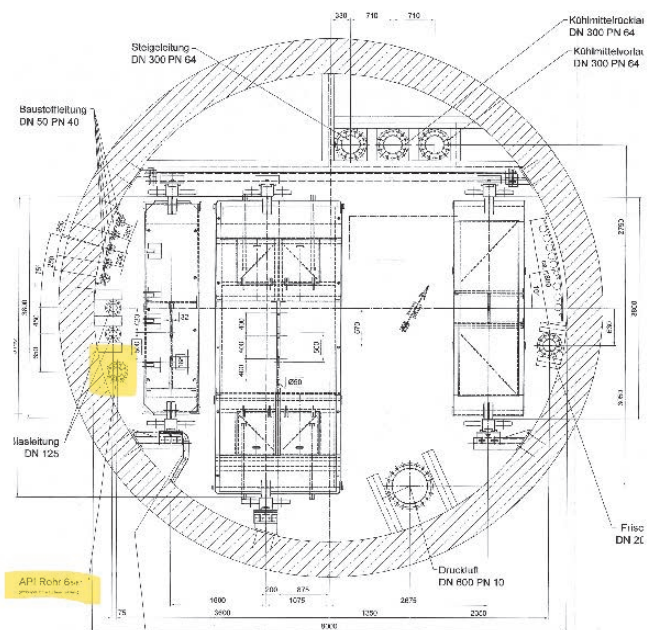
Prosper V Shaft 10 shaft panel for deep sinking.
